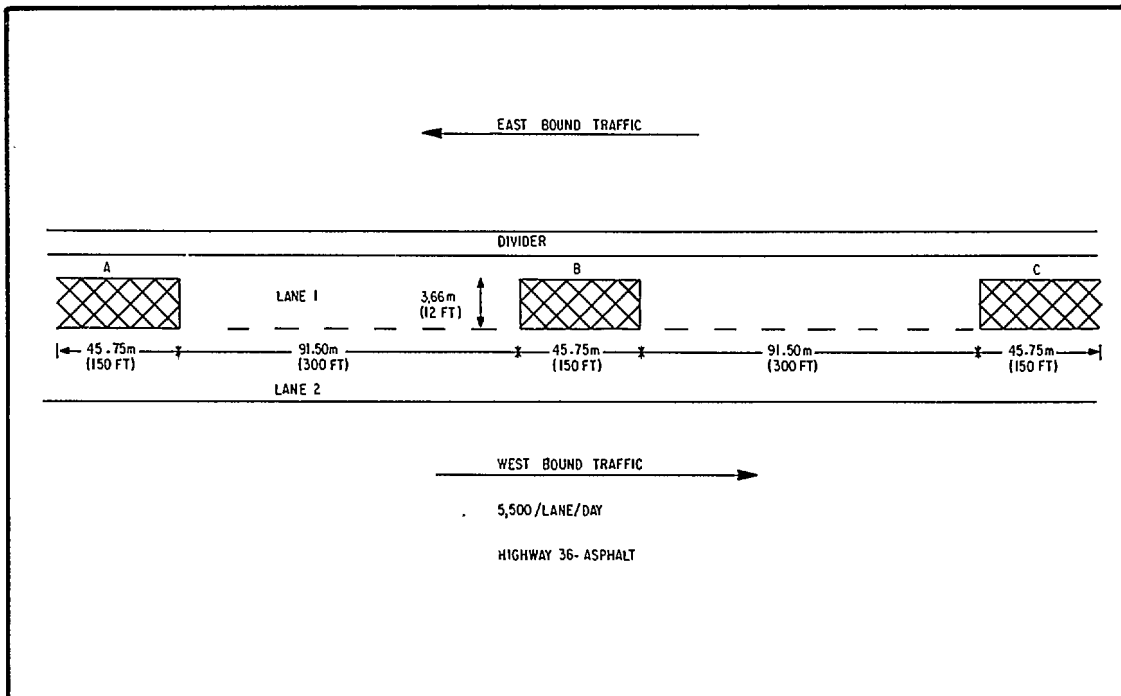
Configuration of Highway 36 Asphalt Test Site
